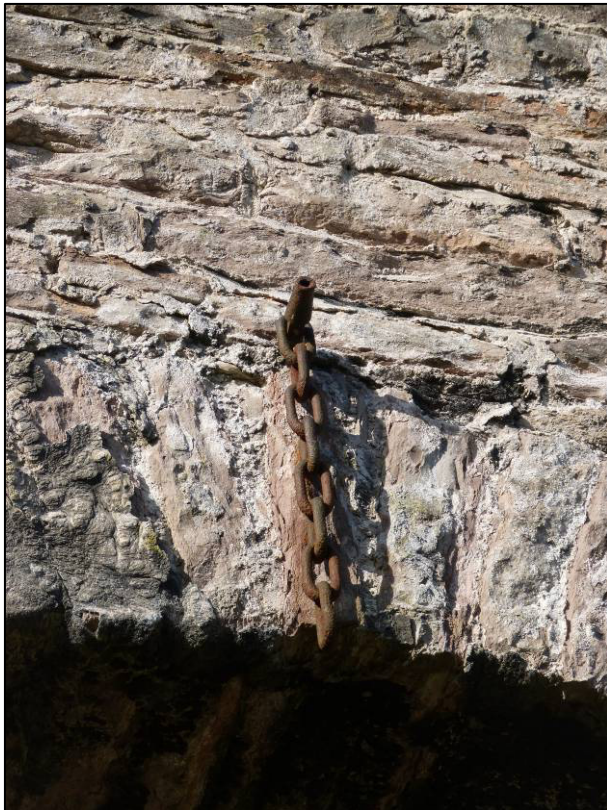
Smardale kilns, bolt and chain over south draw arch on east elevation, looking W (photo 1/009).
